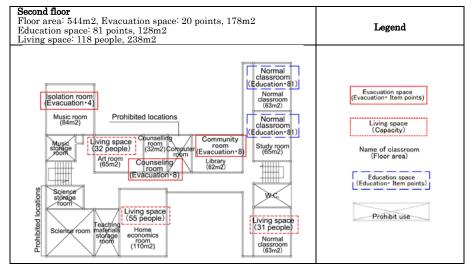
Floor area of evacuation, education, and living space (Second floor)
